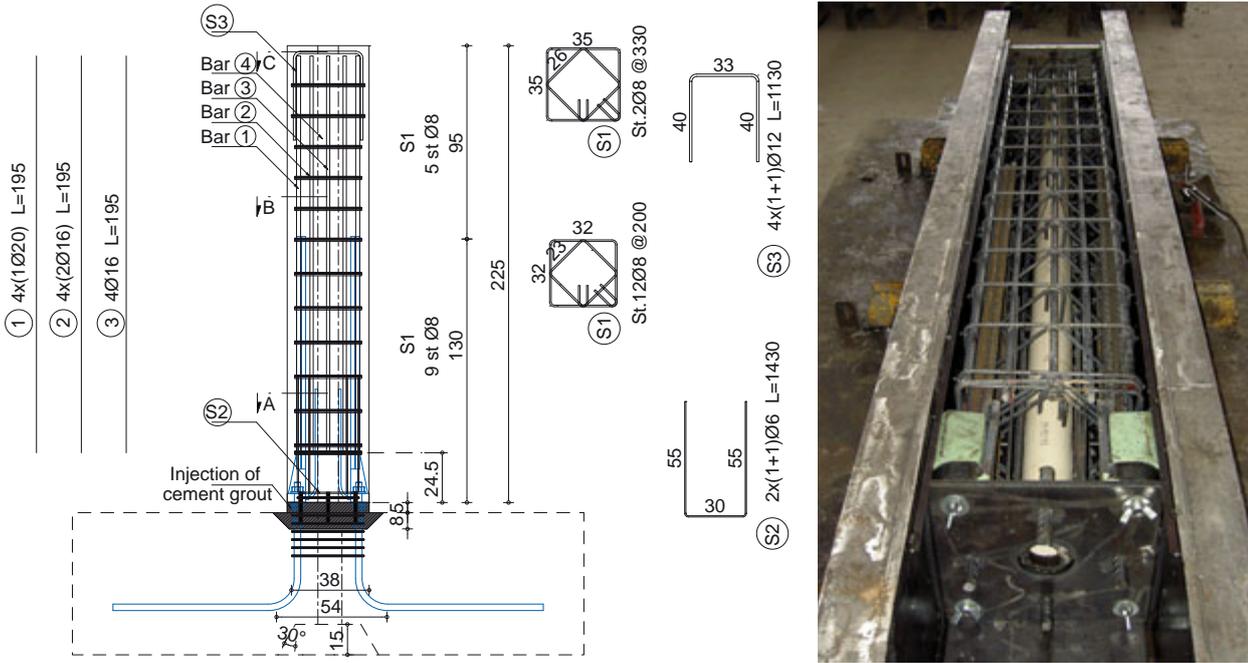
Details of the reinforcement of the connection between column and foundation (4 \varnothing 24mm steel pins added in order to resist shear actions)
